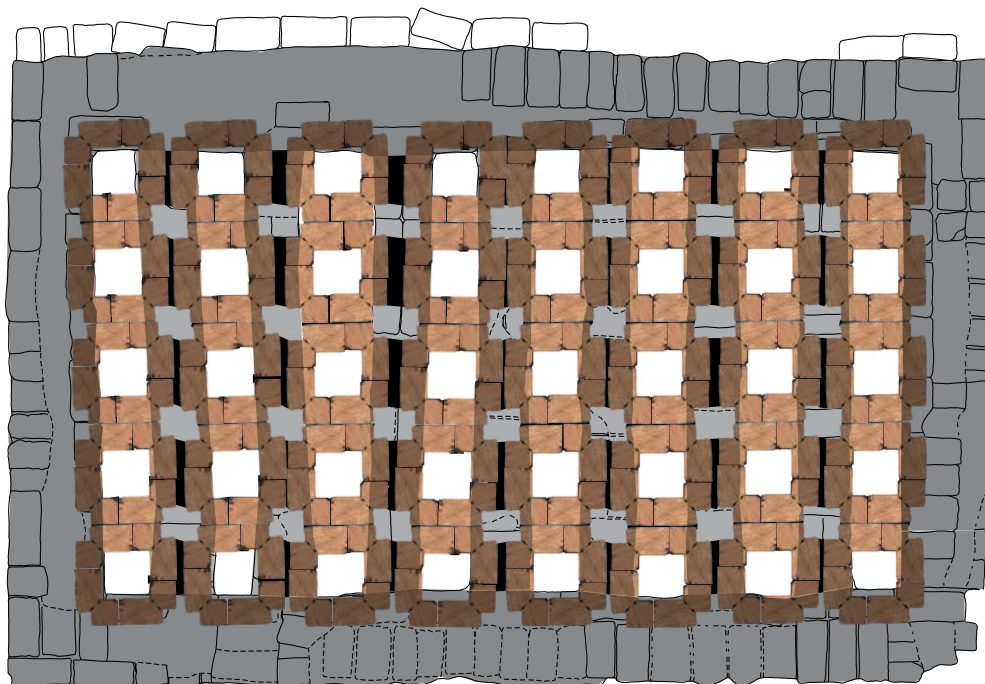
Building F3. Suggested reconstruction of the floor of the firing chamber (scale 1:50).
